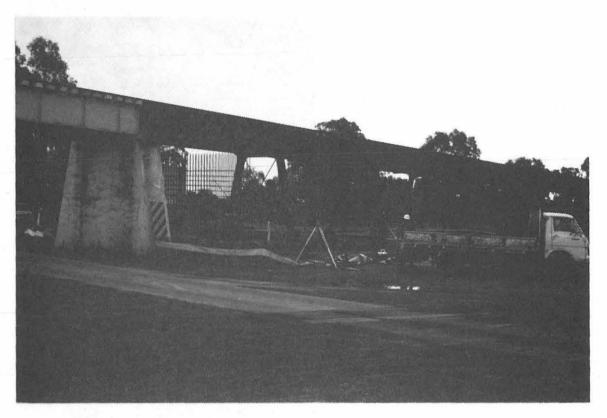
Wagga Wagga Viaduct. Before Oura Rd underbridge & No. 1 viaduct.
